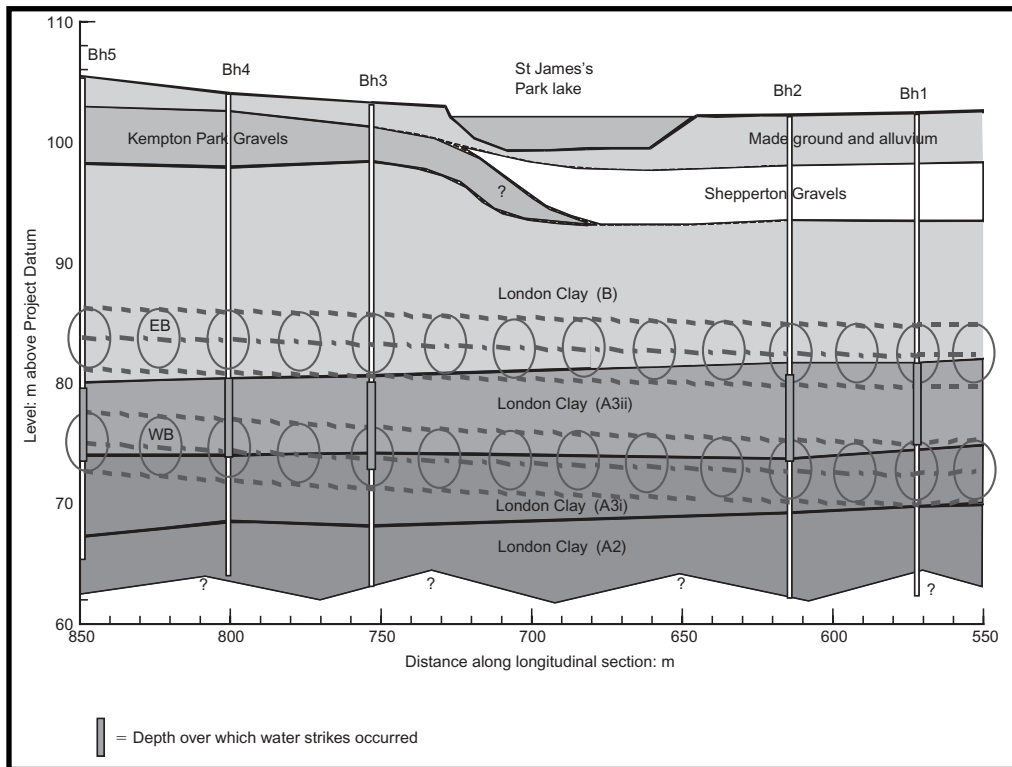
Longitudinal section across St James's Park site showing location of water bearing layer (A3ii) and tunnel alignments (Standing & Burland, 2006)
